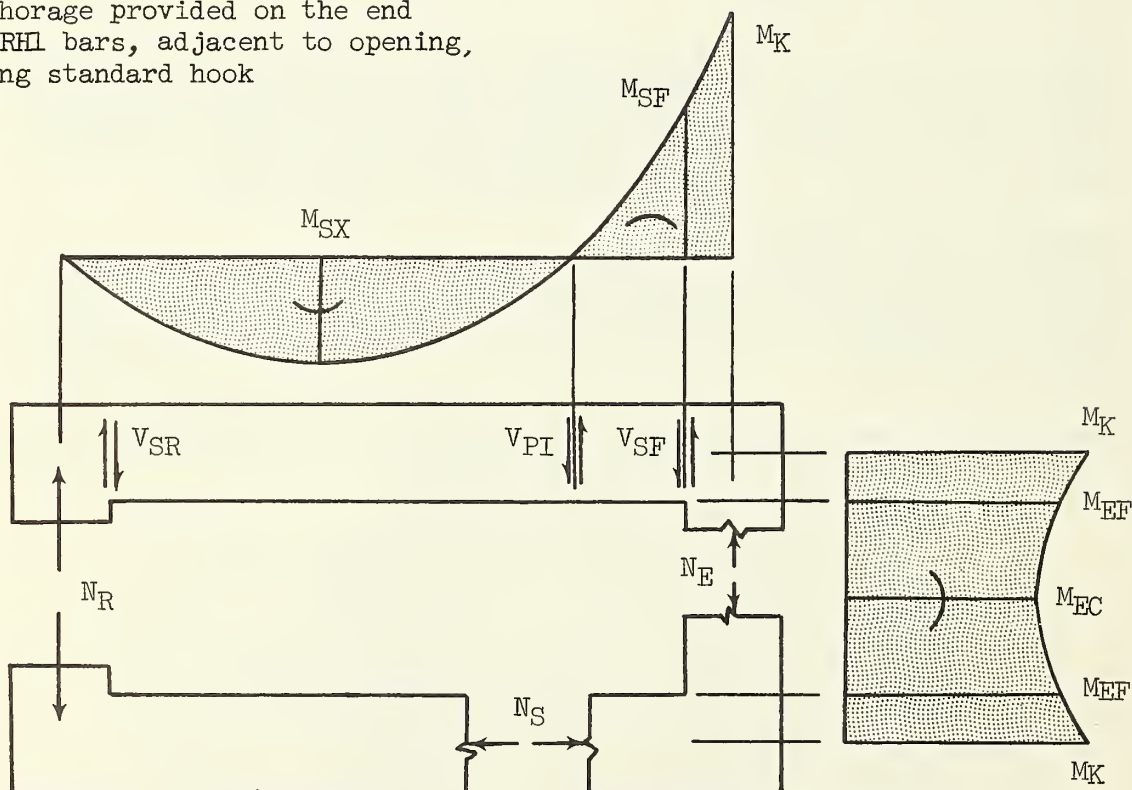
Definition sketch - low stage inlet opening in one endwall.
